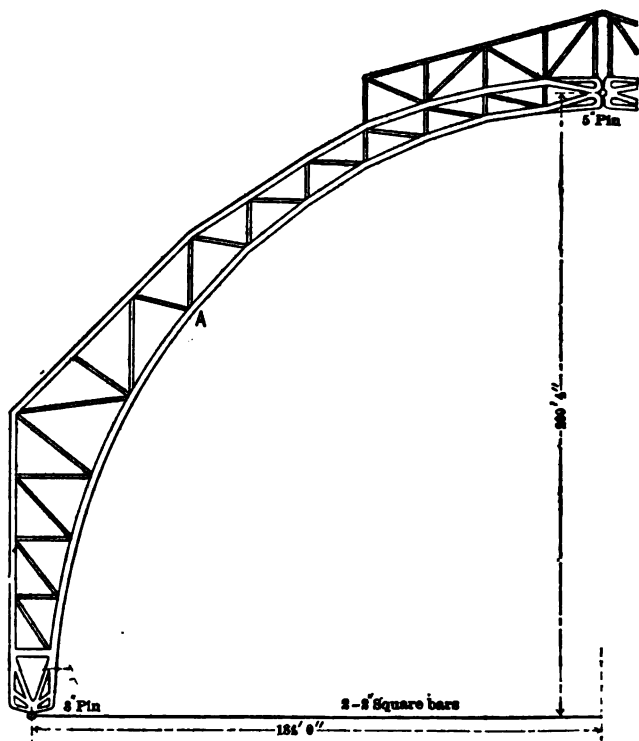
Half Truss. Three-hinged Arch. Manufactures and Liberal Arts Building Chicago Exposition
